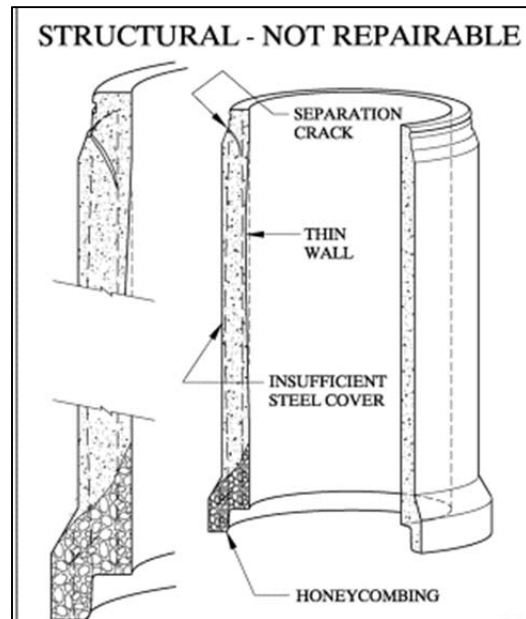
Illustration of a pipe that has structural damage that cannot be repaired.
